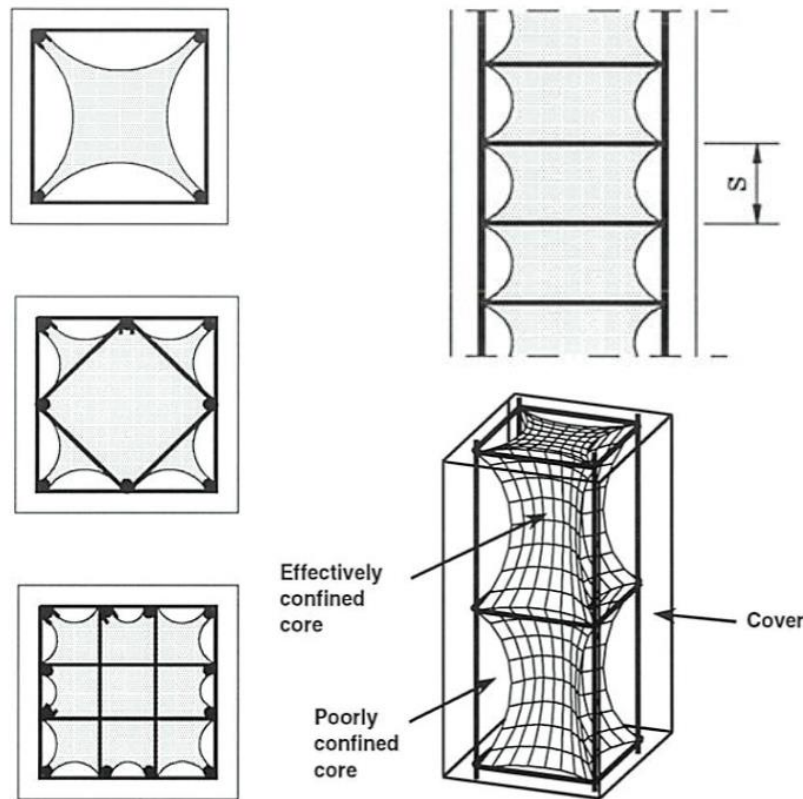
effectively confined area in tied reinforced concrete columns (Foster 1999)
